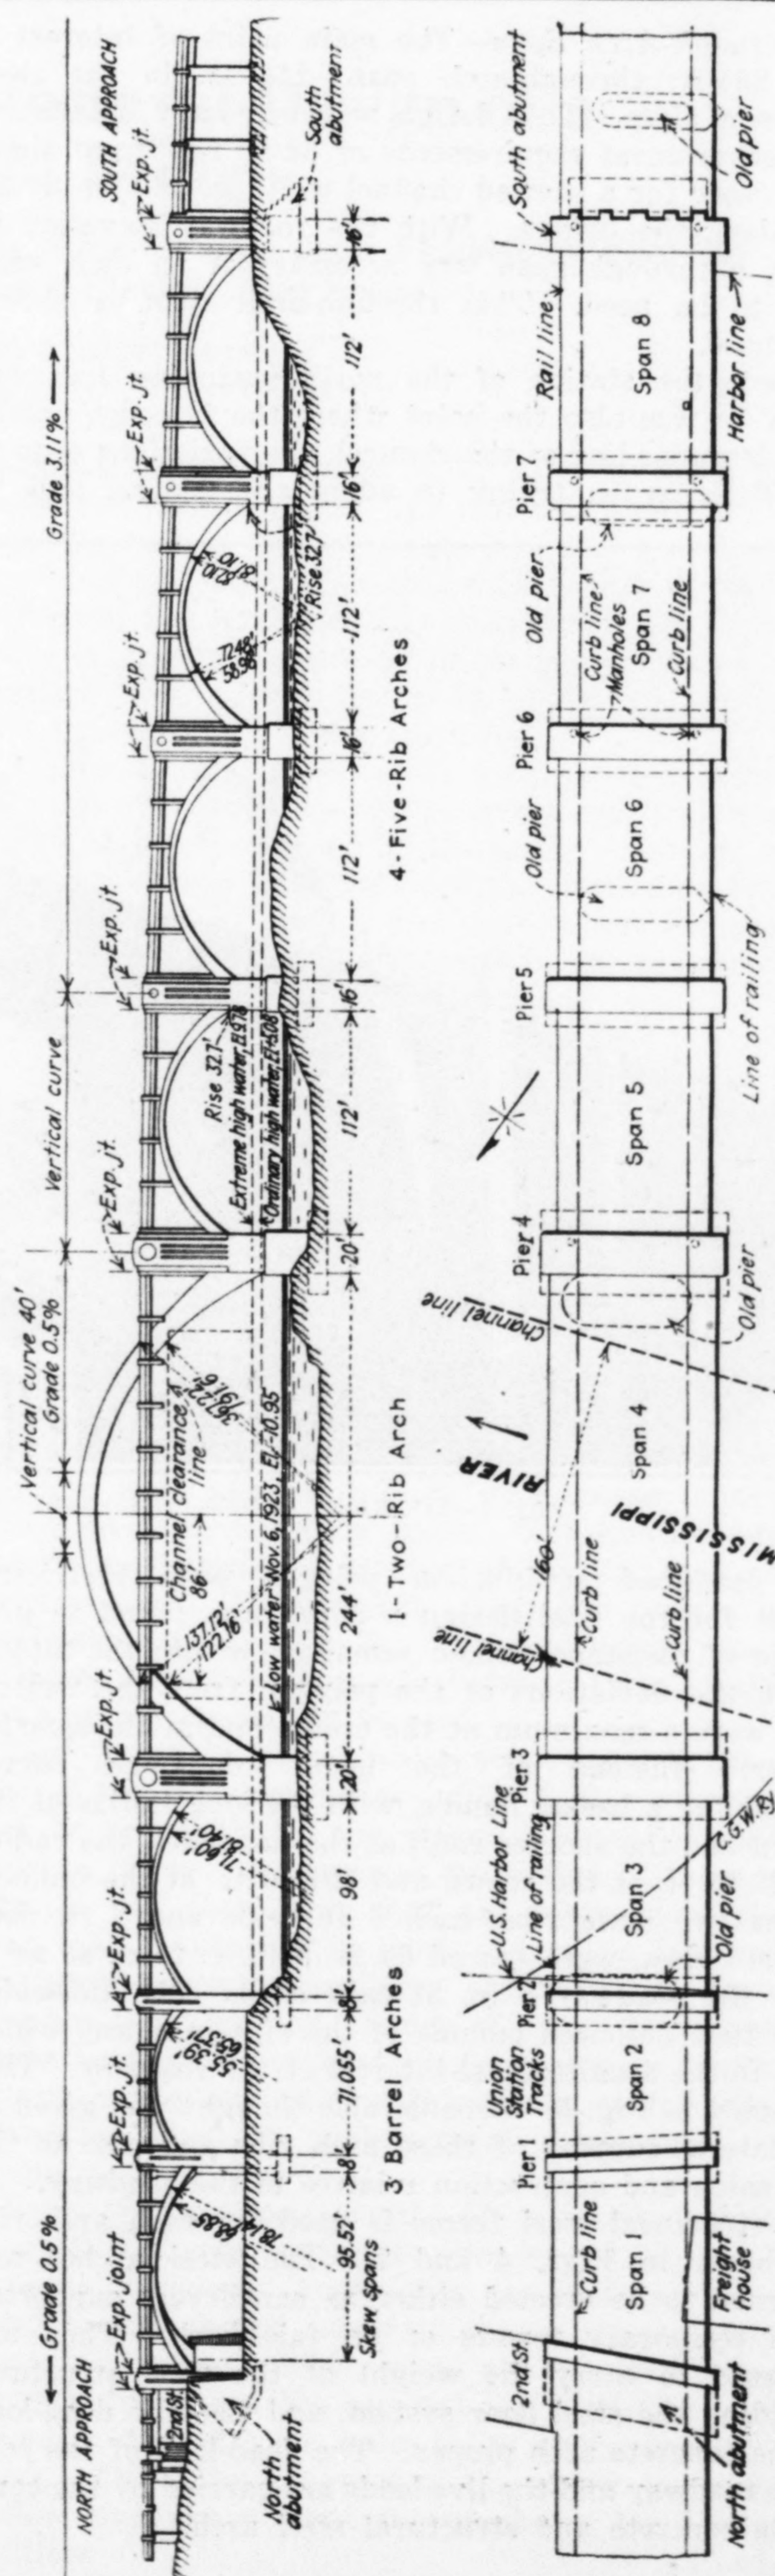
ELEVATION AND PLAN OF ROBERT ST. BRIDGE OVER MISSISSIPPI RIVER
